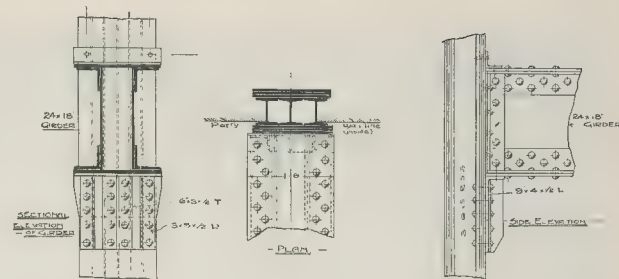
Royal Insurance Building : Detail of Stanchion in Party Wall.
